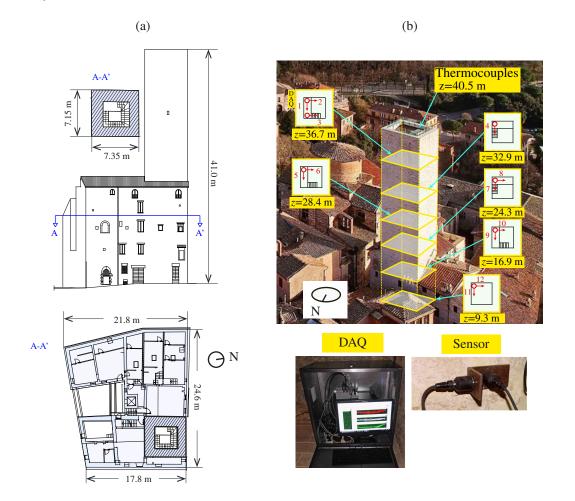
Elevation and plan views (a), and sensors layout for continuous monitoring of the Sciri Tower (b).
